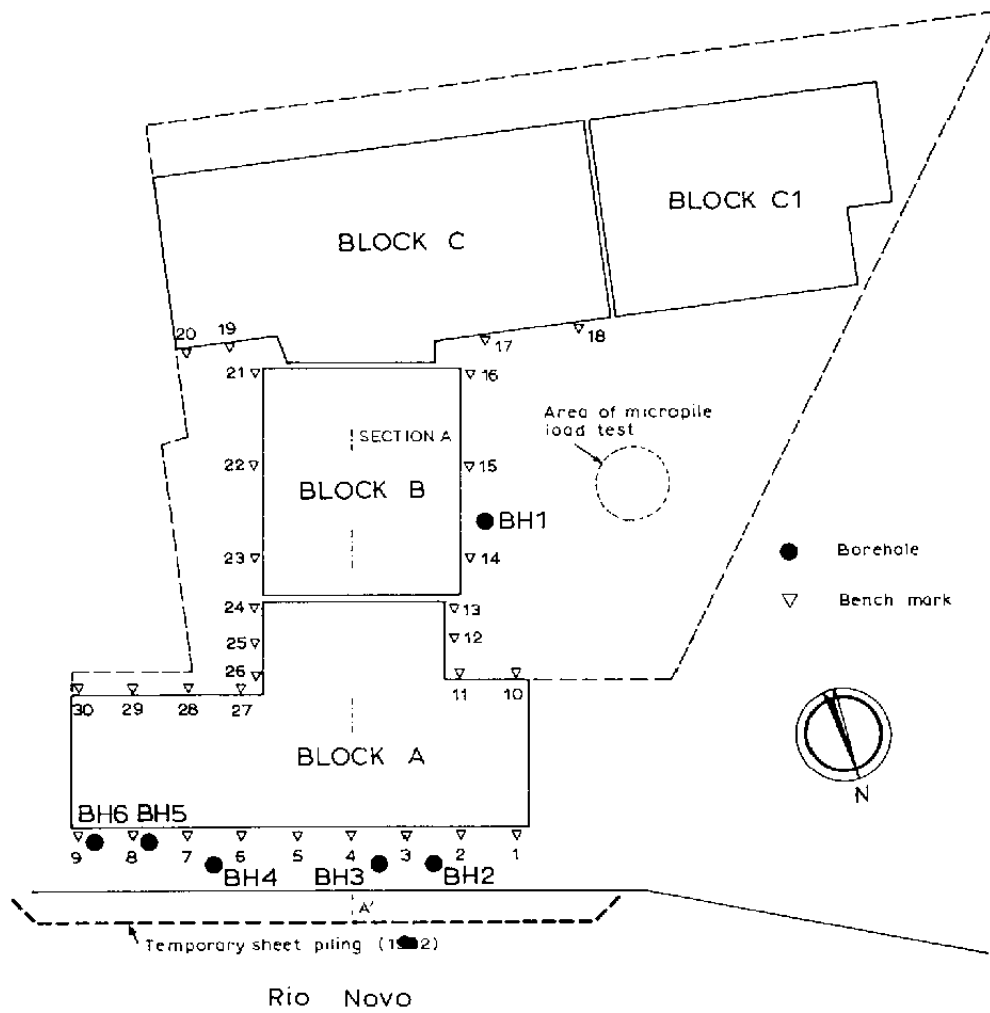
Plan of office building: locations of bench marks and boreholes.
